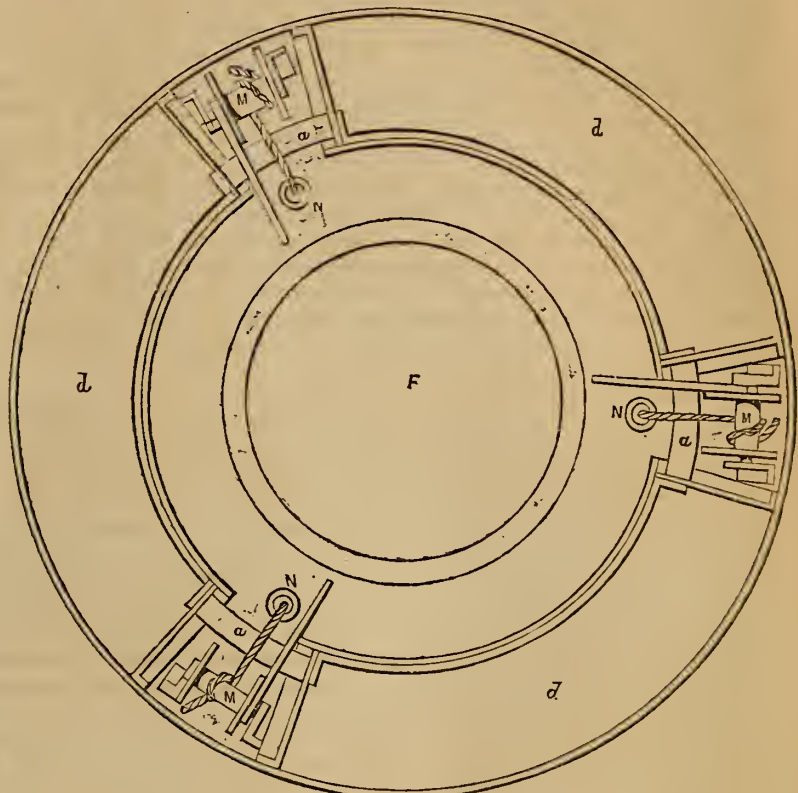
FIG. II.—PLAN AND HORIZONTAL SECTION THROUGH CENTRE.
